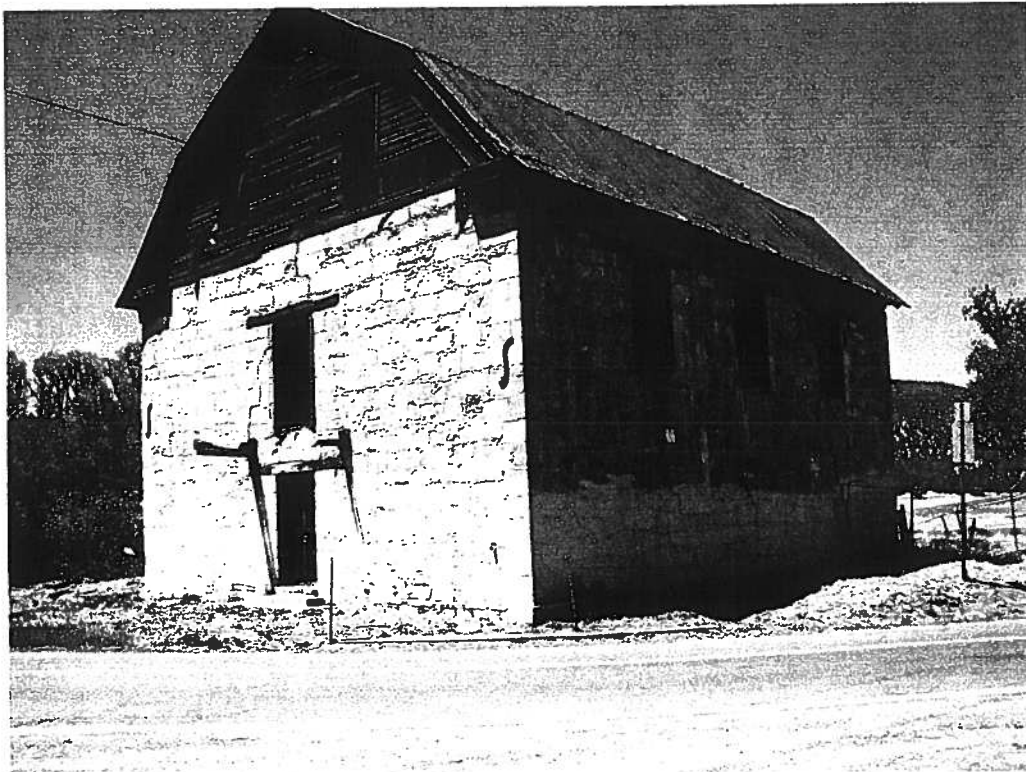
Looking at the southwest corner from across State Road 434 [5/22/03].
